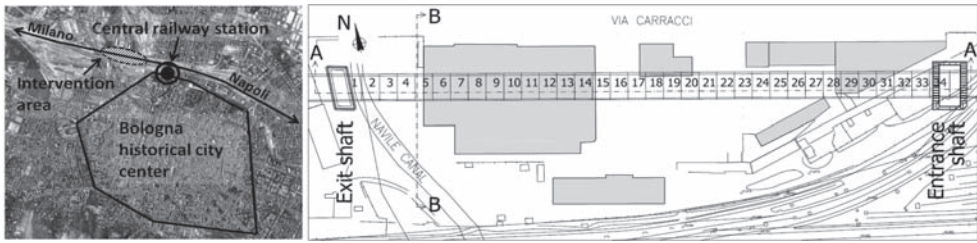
Plan view of the intervention area with location details and indication of excavation sectors.
